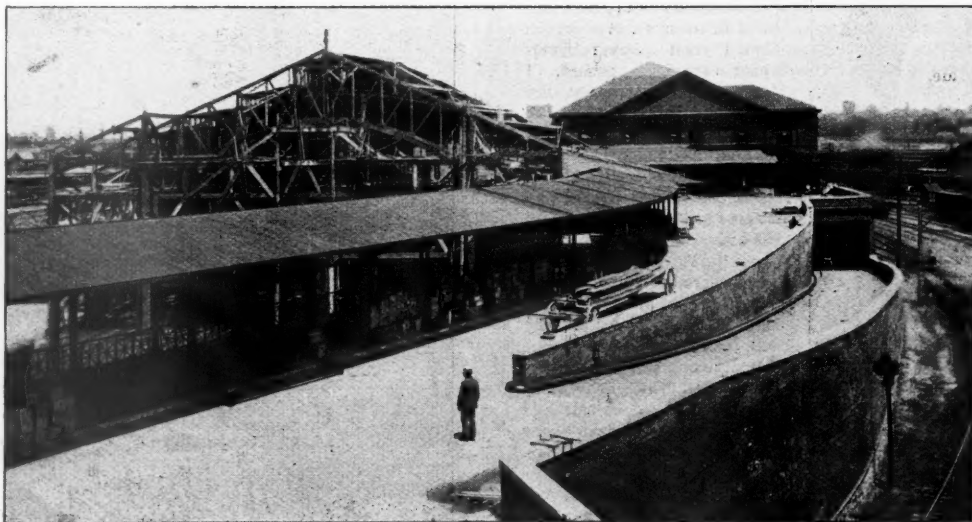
Carriage-ways and Foot-walk Leading from High Street to the Union Passenger Station, Columbus, Ohio.
